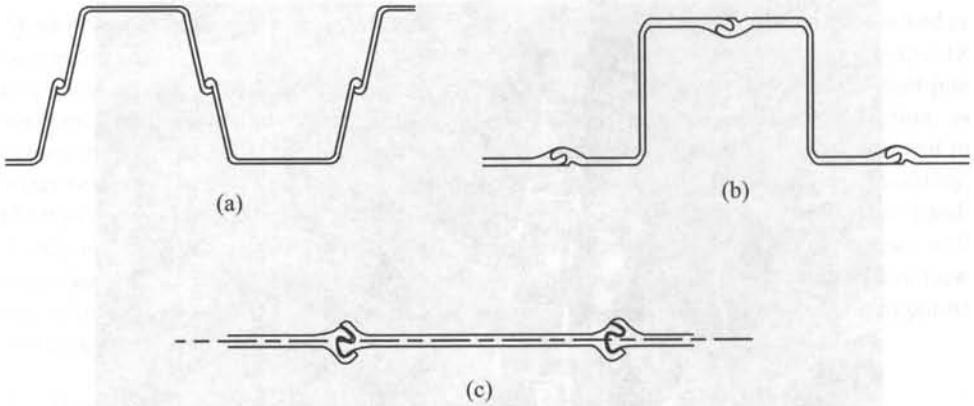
Sections of steel sheet piles: (a) U pile, (b) Z pile, and (c) straight pile.
